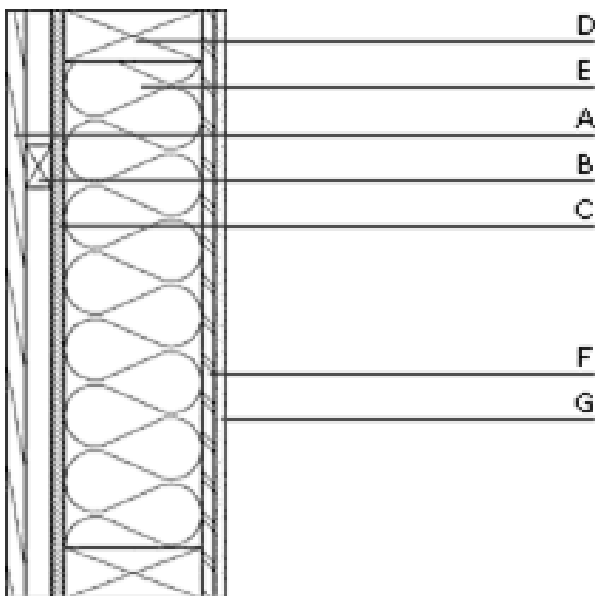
Exemplary timber construction component of the ‘dataholz.eu’ catalogue – component alternative outer wall awrhh01a-09 (HFA Austria, 2018)
